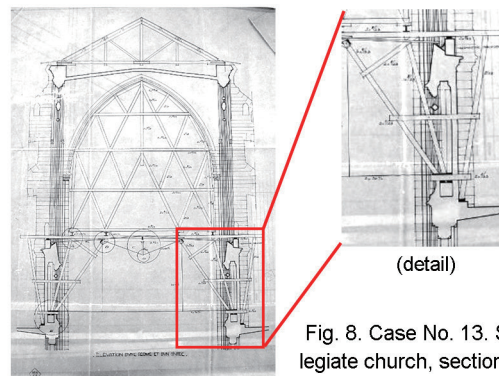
Case No. 13. Saint-Quentin, collegiate church, section showing the scaffolding and the centering
